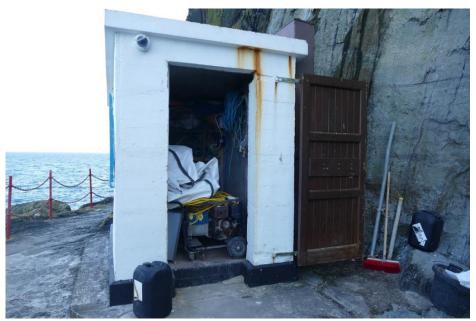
CCTV installed on the storage building adjacent to the landing pier
